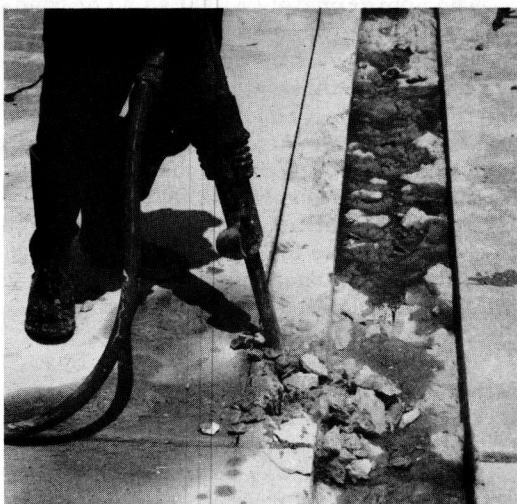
Removing concrete adjacent to joints at Seymour-Johnson Air Force Base.
